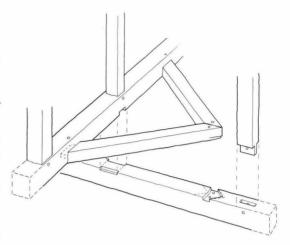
Assembly detail of the base beams, horizontal braces and post.
